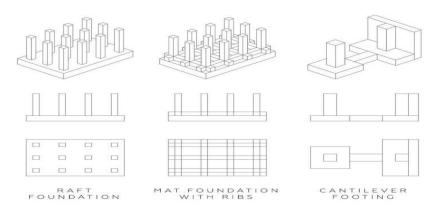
Types of foundation (Jonathan Strahan, 2011)
